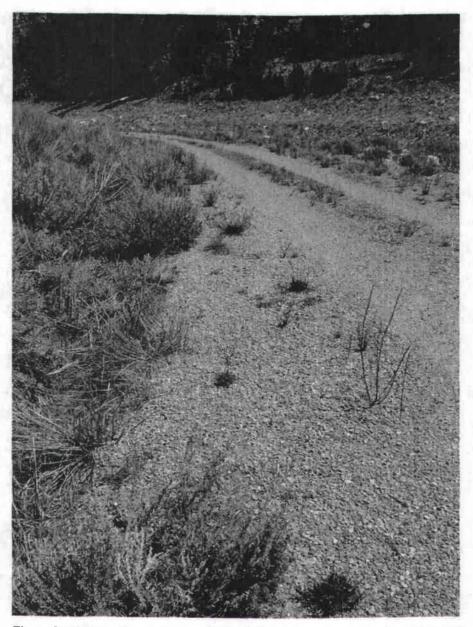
Reclaimed road that runs through Crandall Canyon is to remain for access and egress.
